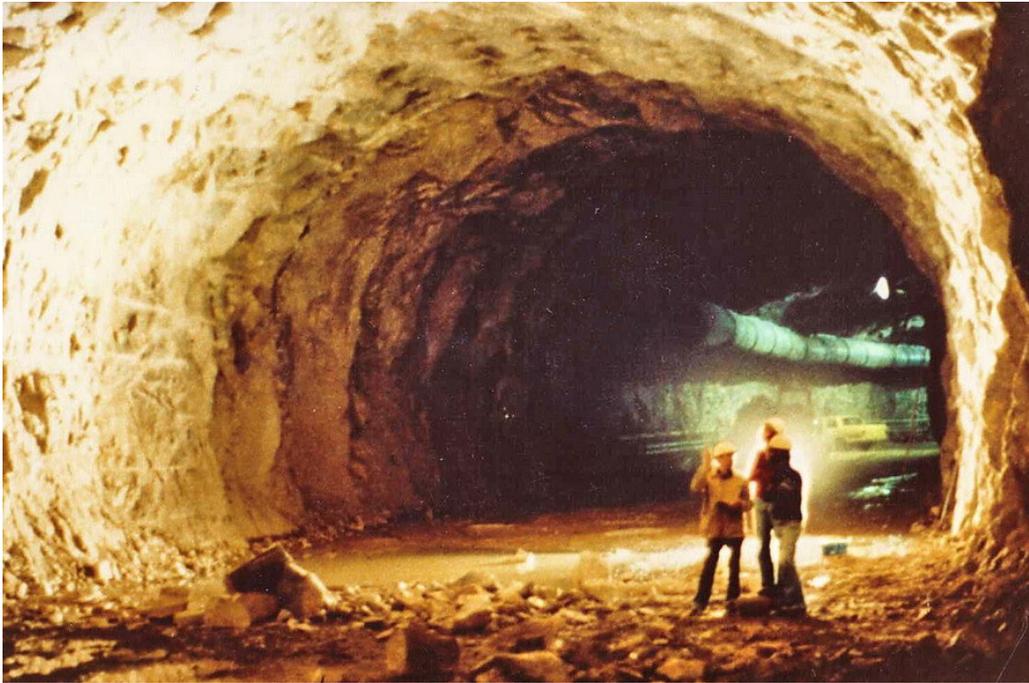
The 12 m span 8 m high top heading for the tailrace tunnel was constructed by full-face drill-and-blast and, because of the excellent quality of the massive gneiss, was largely unsupported.
